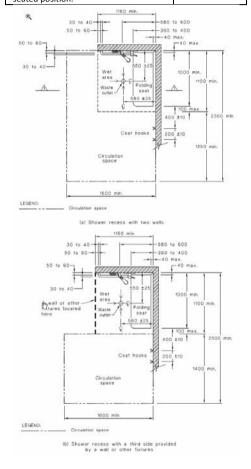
SHOWER RECESS FITTINGS-ELEVATION
